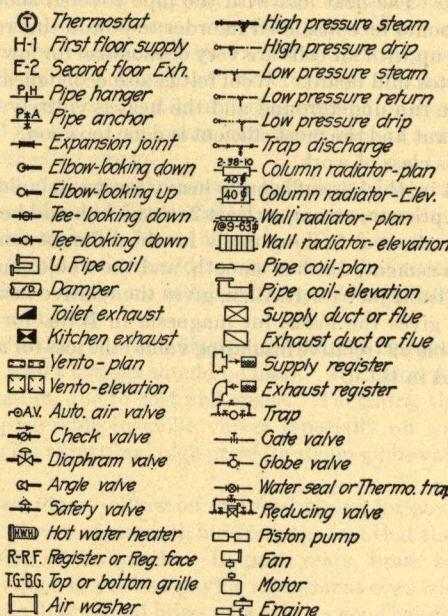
System of characters for use in drawing plans for power heating and ventilation.
